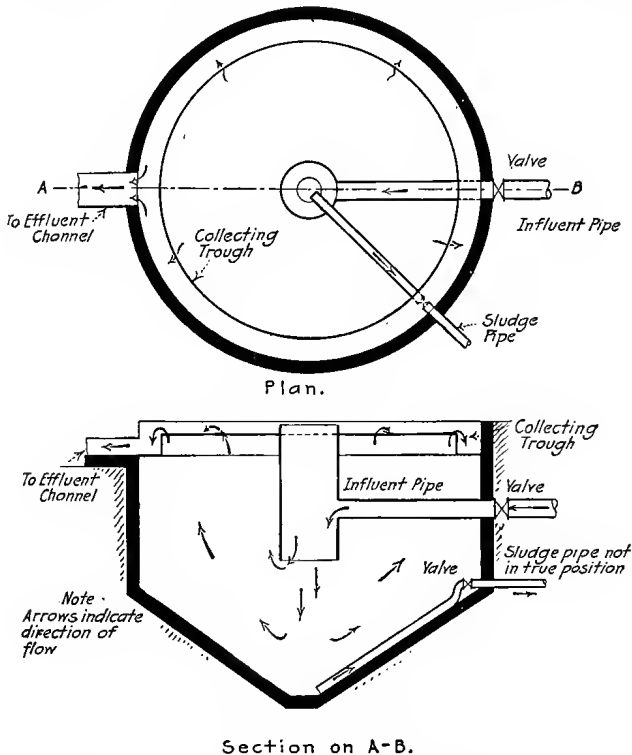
Final-sedimentation tank, Fitchburg, Mass.
